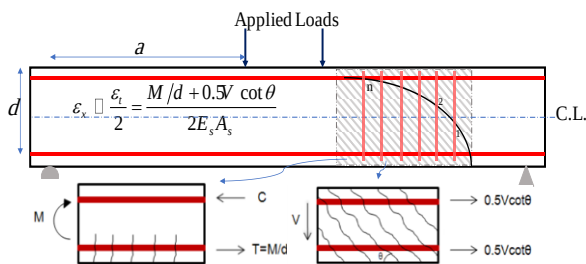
Extension of RC panel to RC beams and equivalent longitudinal strain calculations
